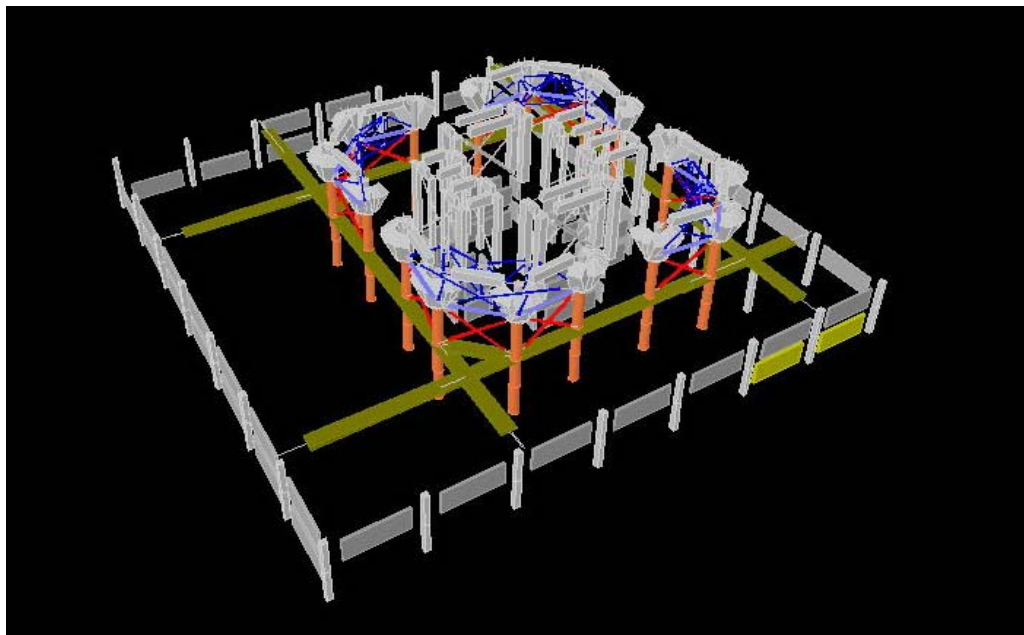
Drag Struts, 3-D Trusses and Damper Braces
